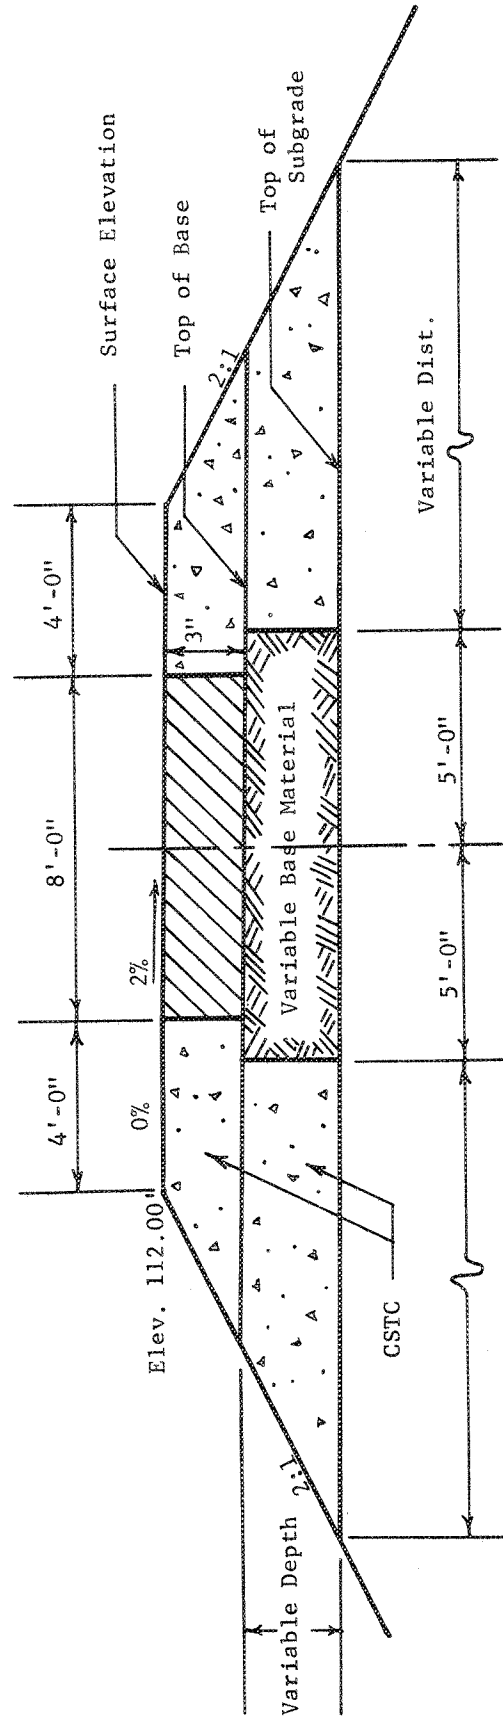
TYPICAL CROSS-SECTION OF PAVEMENT STRUCTURE
